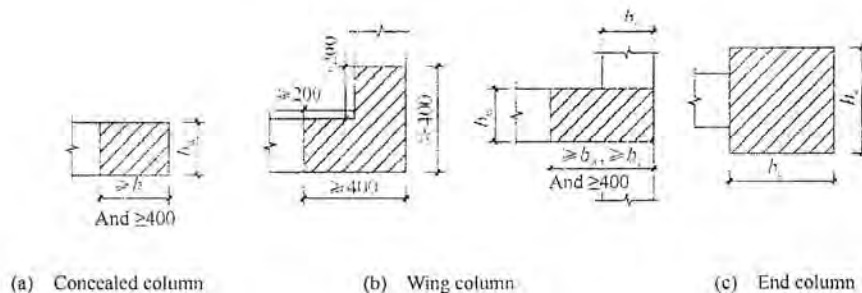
Range of Structural Boundary Components for Seismic Wall
